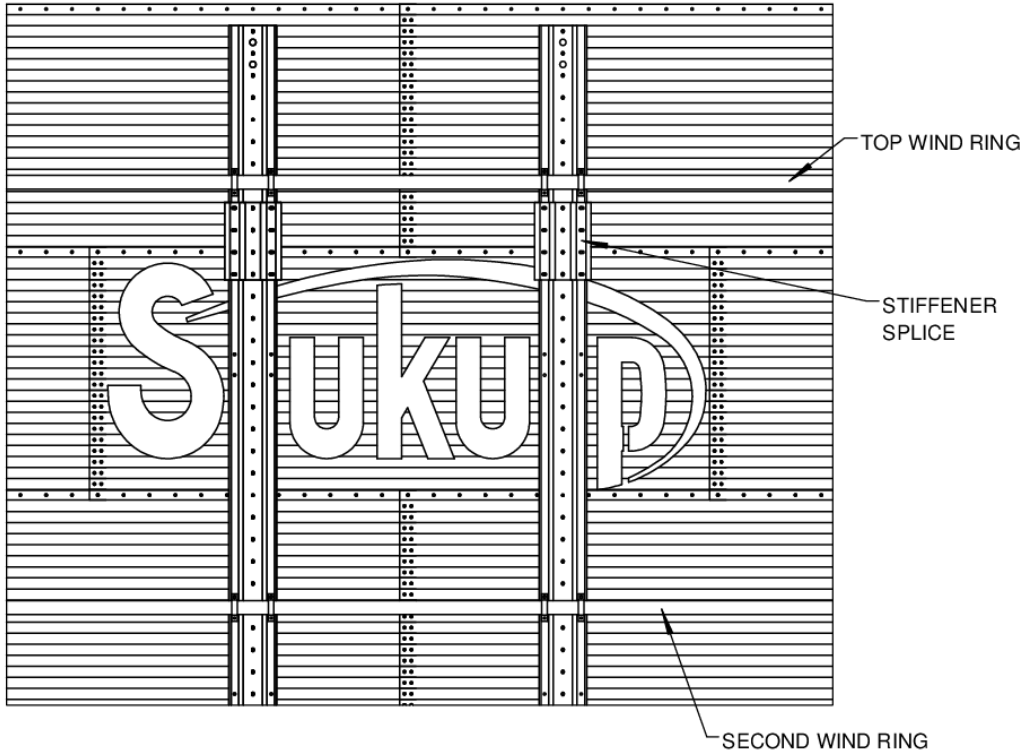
Attaching Sukup logo sheet to bin with two stiffeners per sidewall sheet
